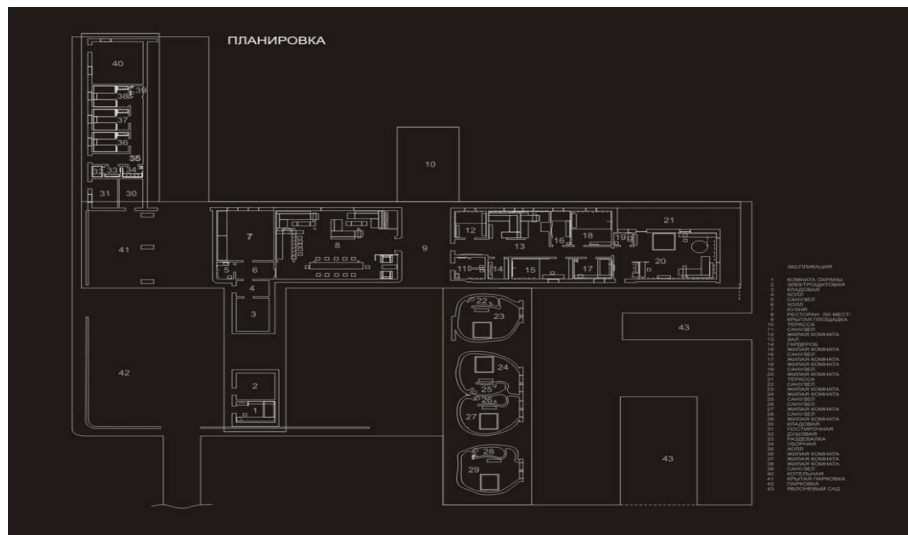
Friend House Hotel- Plan (<http://www.archdaily.com/51767/friendhouse>)
